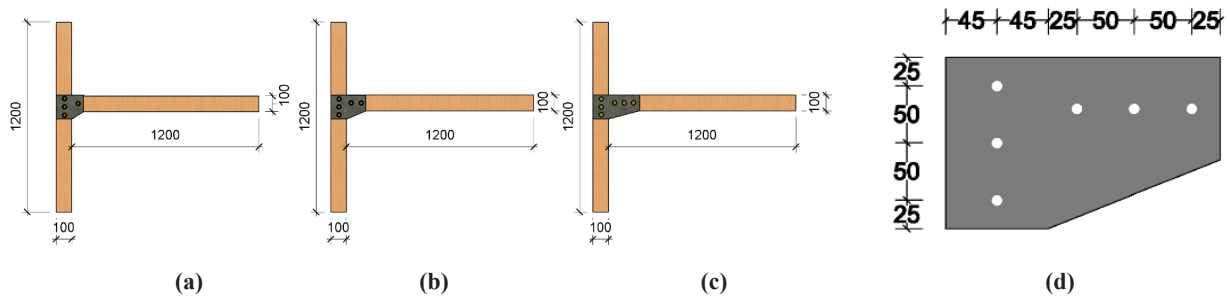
The Types of Specimens That Used in the Study. (a). Specimen with One Bolt. (b). Specimen with Two Bolts. (c). Specimen with Three Bolts. (d). Details of Bolt Spacing (50 mm), End Distance (25 mm), and Edge Distance (25 mm) for a Specimen with Three Bolts (Units in Millimeters).
